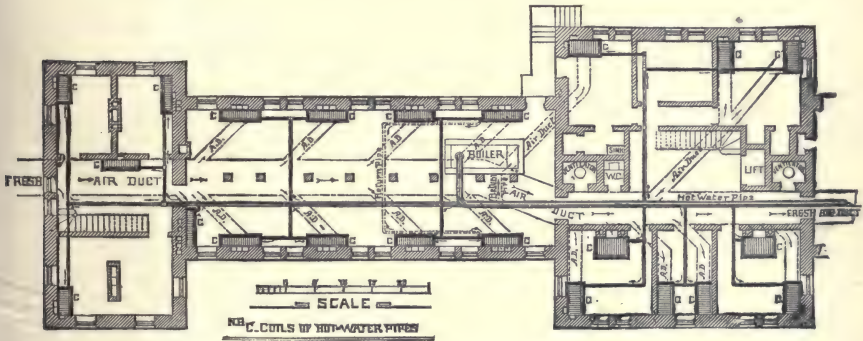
BARNES HOSPITAL, PLAN OF BASEMENT, WITH FRESH-AIR DUCTS AND HEATING APPARATUS.
